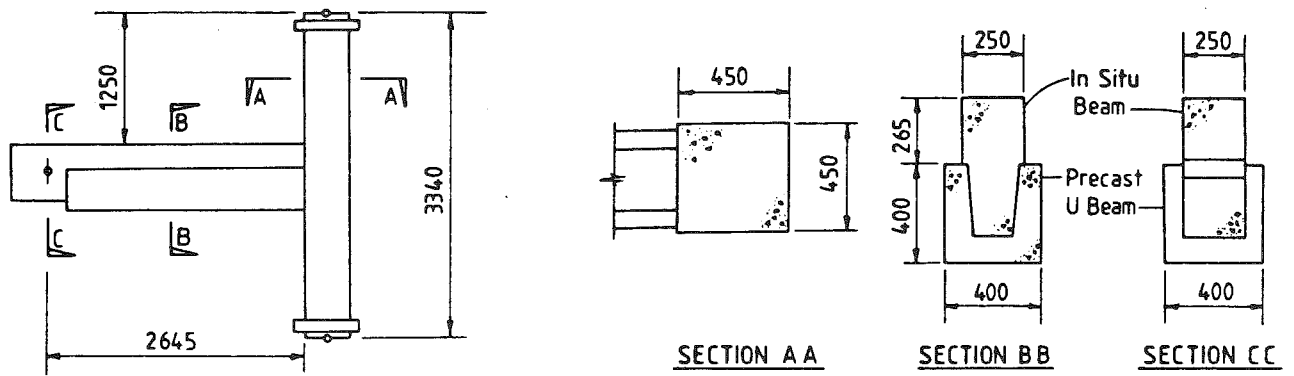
Elevation and Sections of Test Units (Dimensions in mm) [4].
